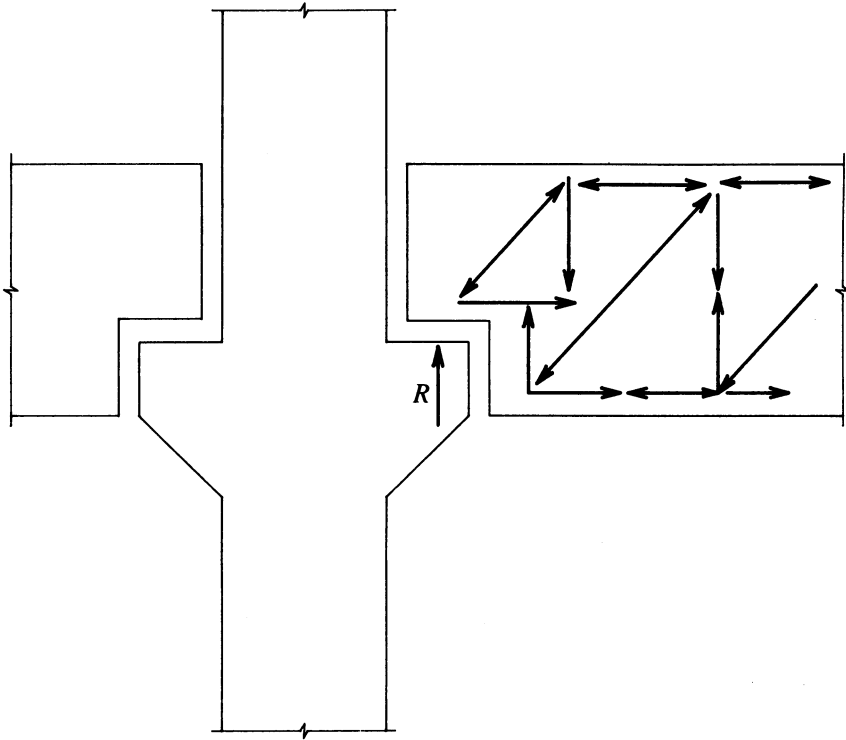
Forces and moment on the dapped end of a prestressed concrete beam.
